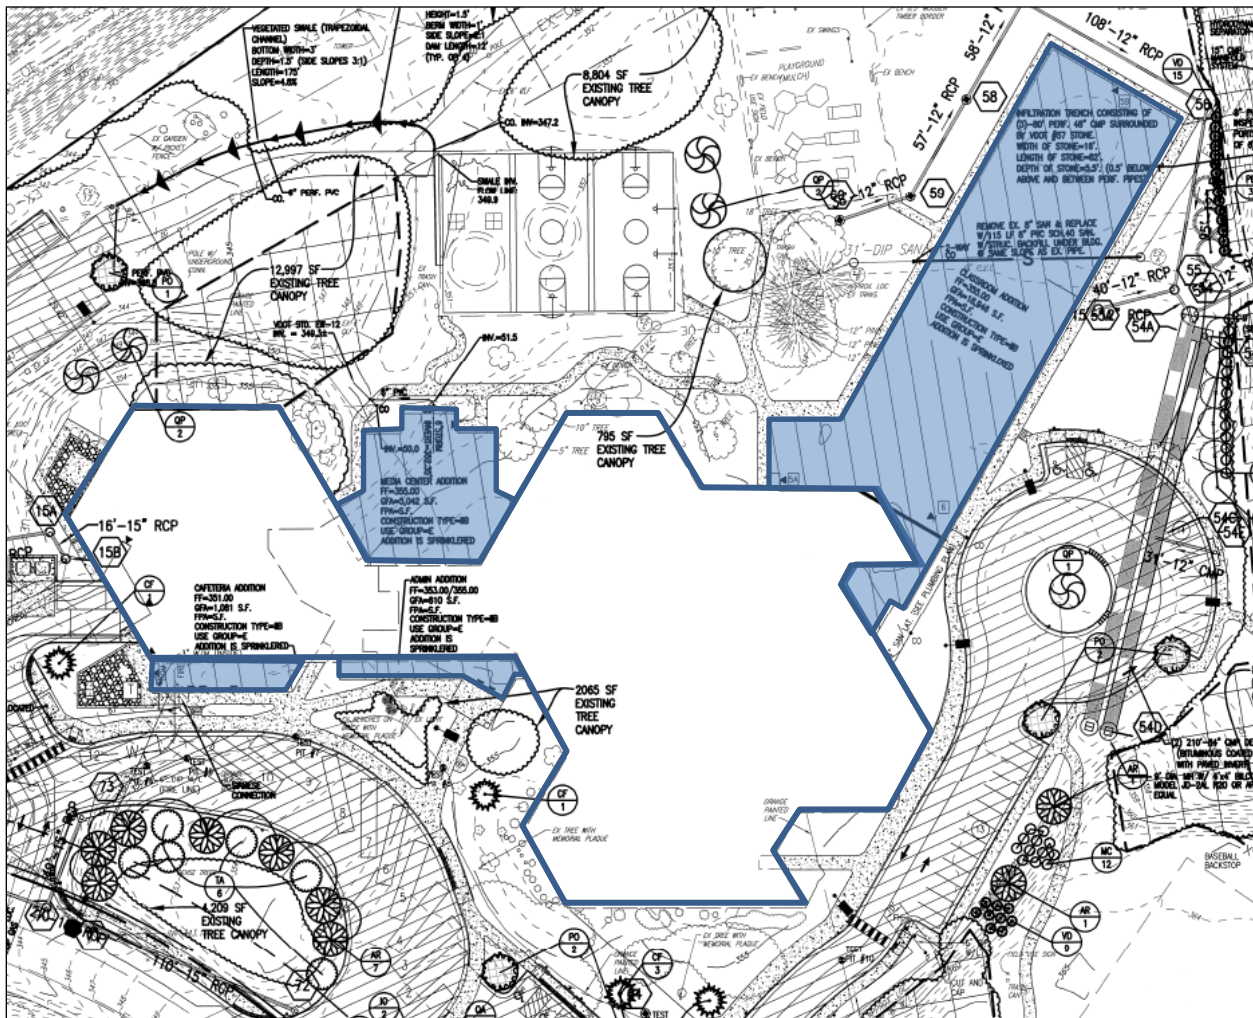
The proposed layout for PRC C-377 (Source – ADTEK Engineers, May 10, 2013)
